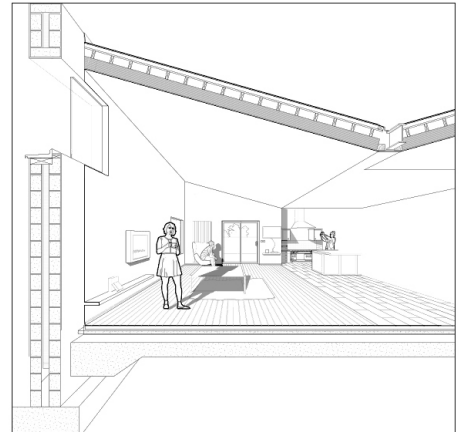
Perspective Section Drawing expressing the wall, beam and foundations of House A. Author's own.
